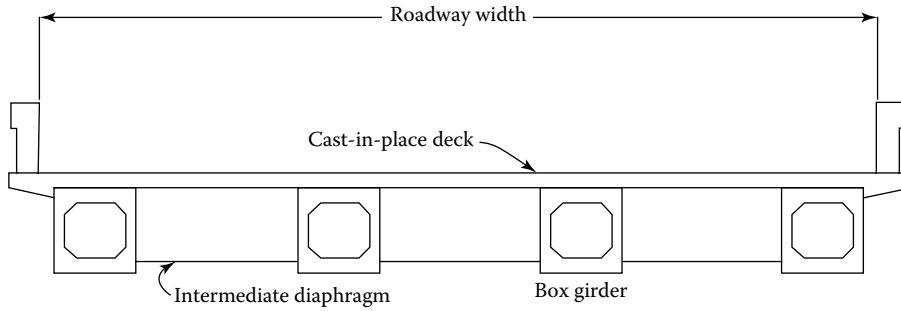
Superstructure Type *b*: typical cross section of a spread box beam bridge. The deck slab, cast to act compositely with the box girders, spans transversely over the precast, prestressed concrete box beams. Diaphragms are provided between the box girders. The number of box beams can be increased as necessary to provide for the required bridge width.
